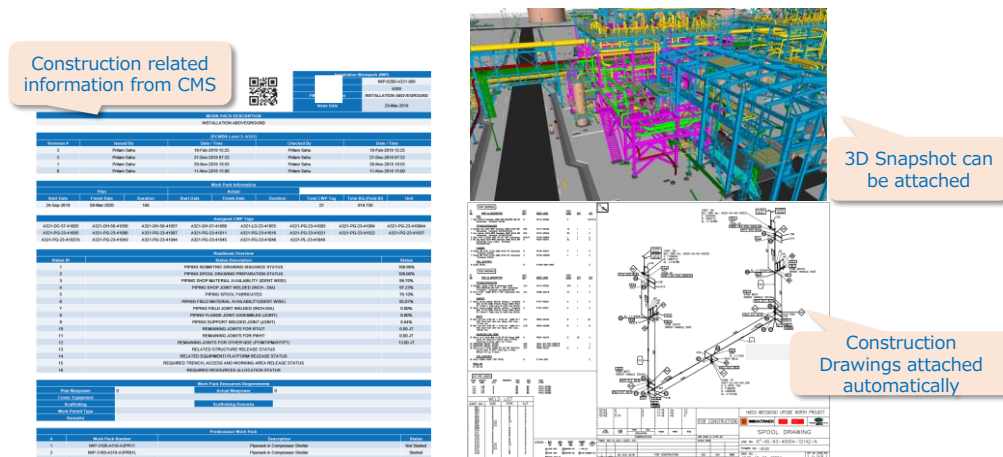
An Image of Construction Work Package for a Refinery Construction Work
